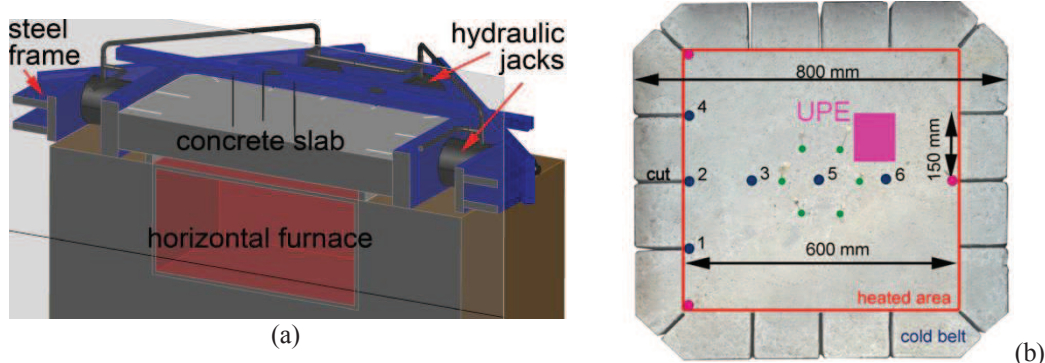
Spalling test on concrete slabs subjected to Standard Fire at the intrados under biaxial membrane loading: (a) slab and loading system on the furnace, and (b) specimens geometry and location of UPE (green dots = pressure gauges and thermocouples, blue dots = displacement transducers).
